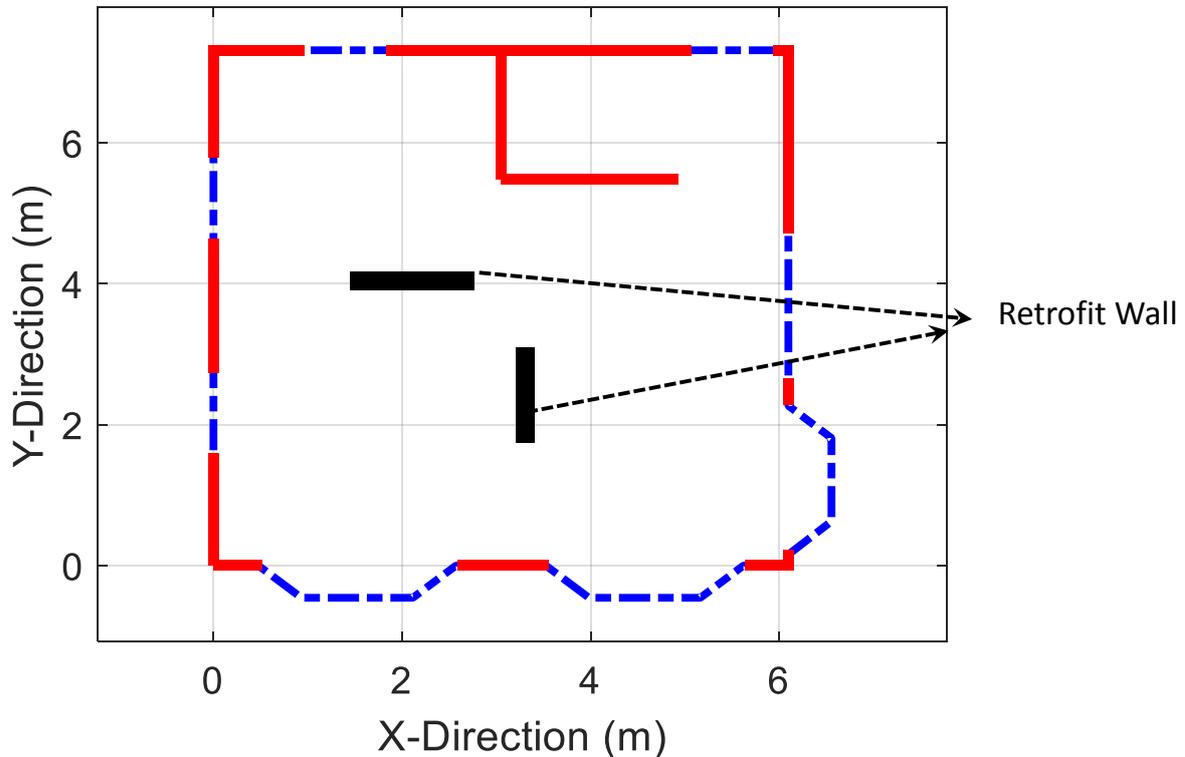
Retrofit Design for the example building with 0.9g, 20% POE.
